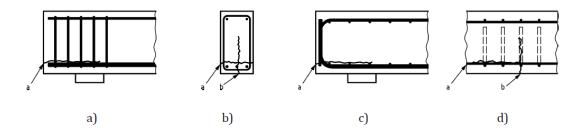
Examples of reinforcement controlling delamination and longitudinal cracks
